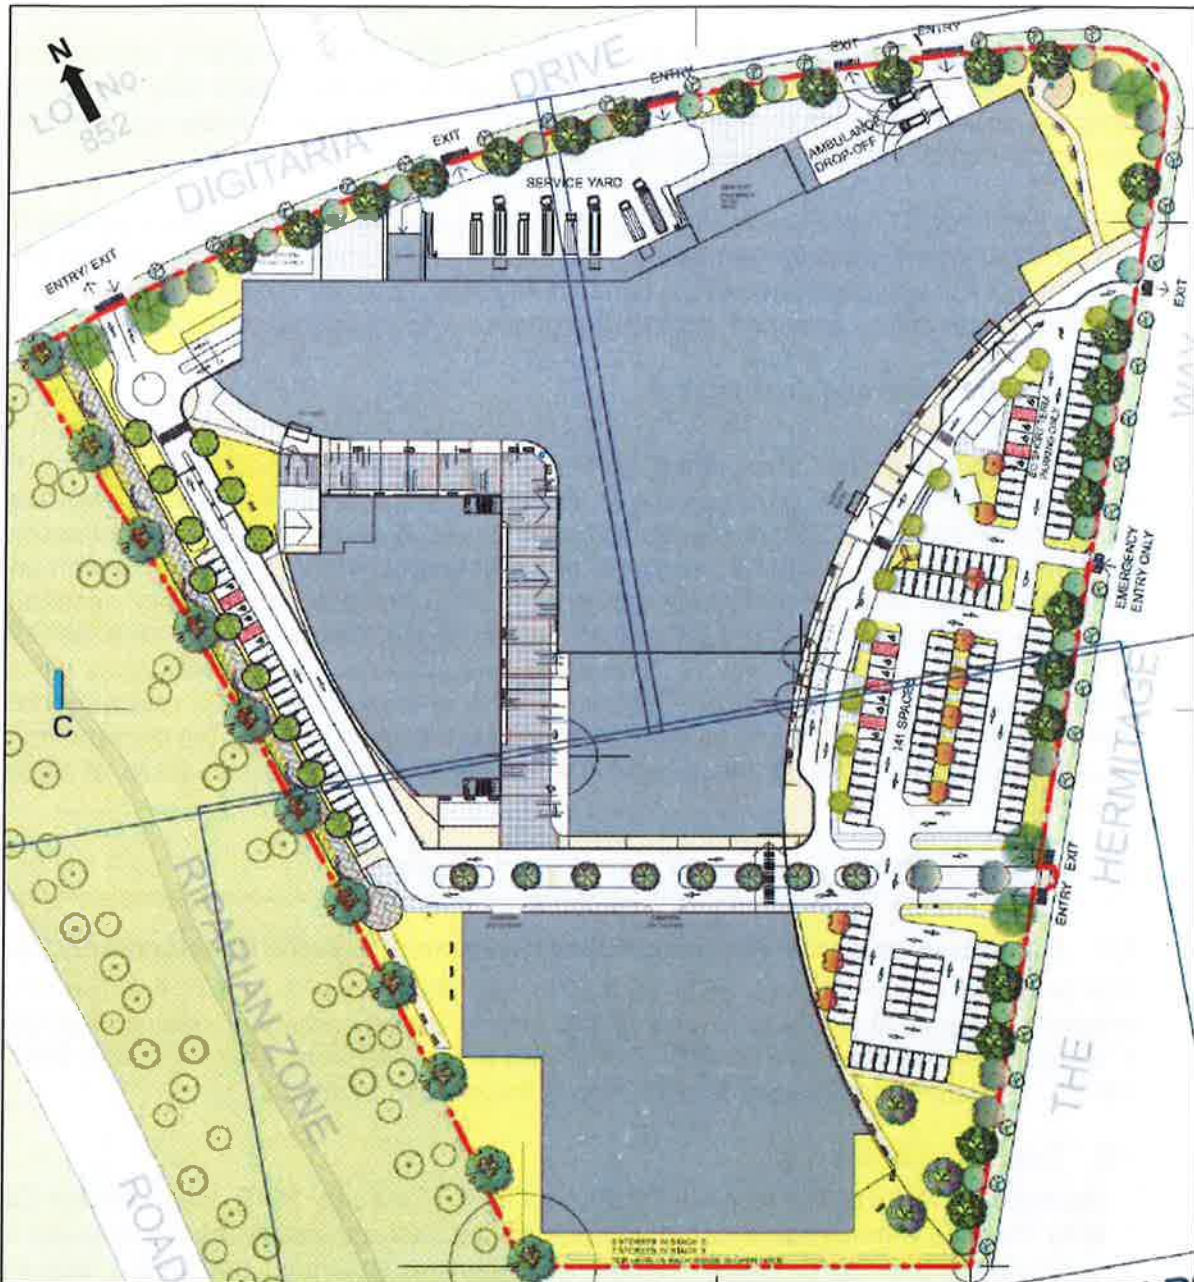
Concept landscaping proposed for the CMC (Source: Applicant's EIS)
